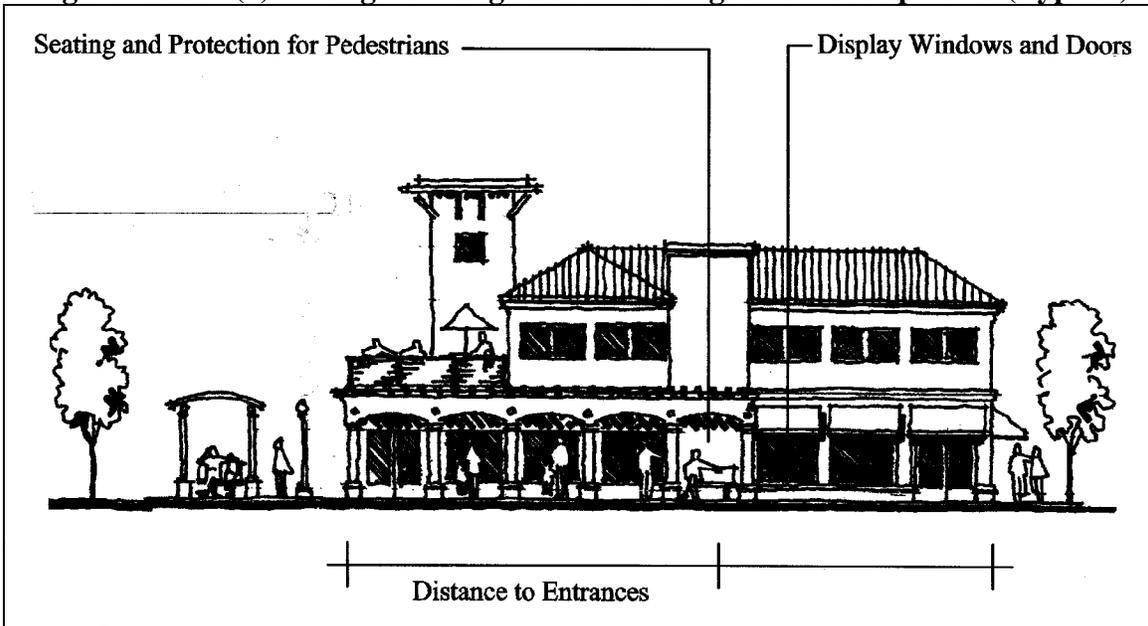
B (1) – City Center Building Design Elements (Typical)
